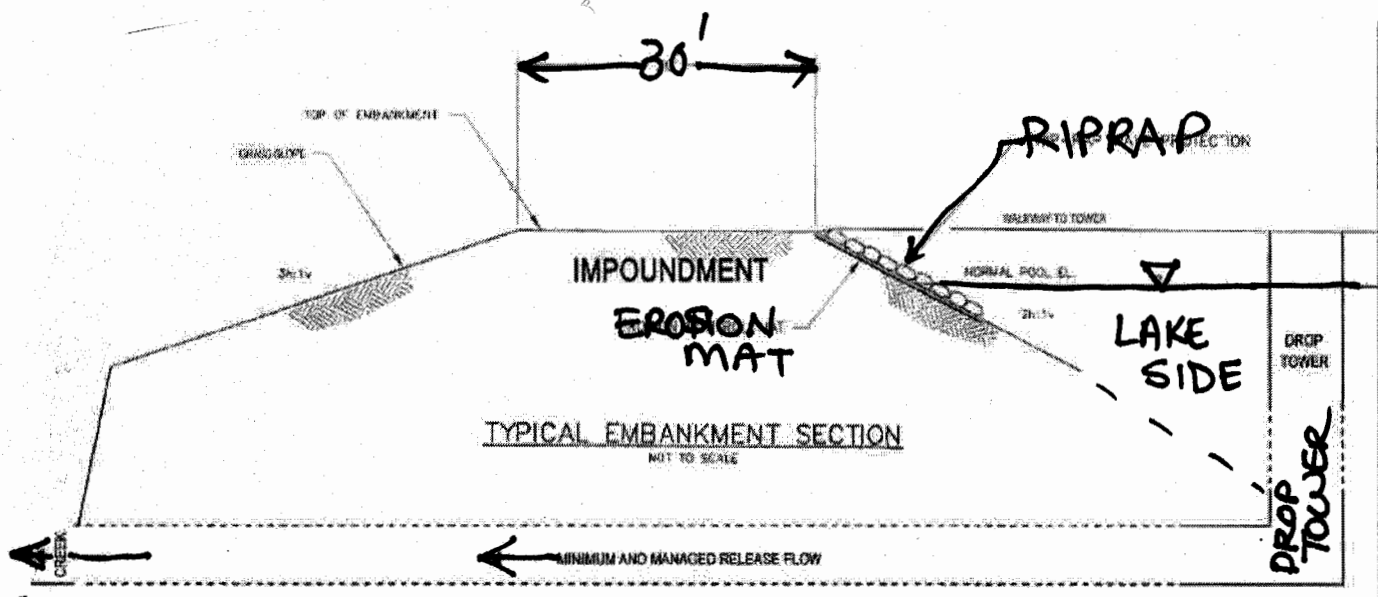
Example cross-section of proposed impoundment.. CROSS SECTION
